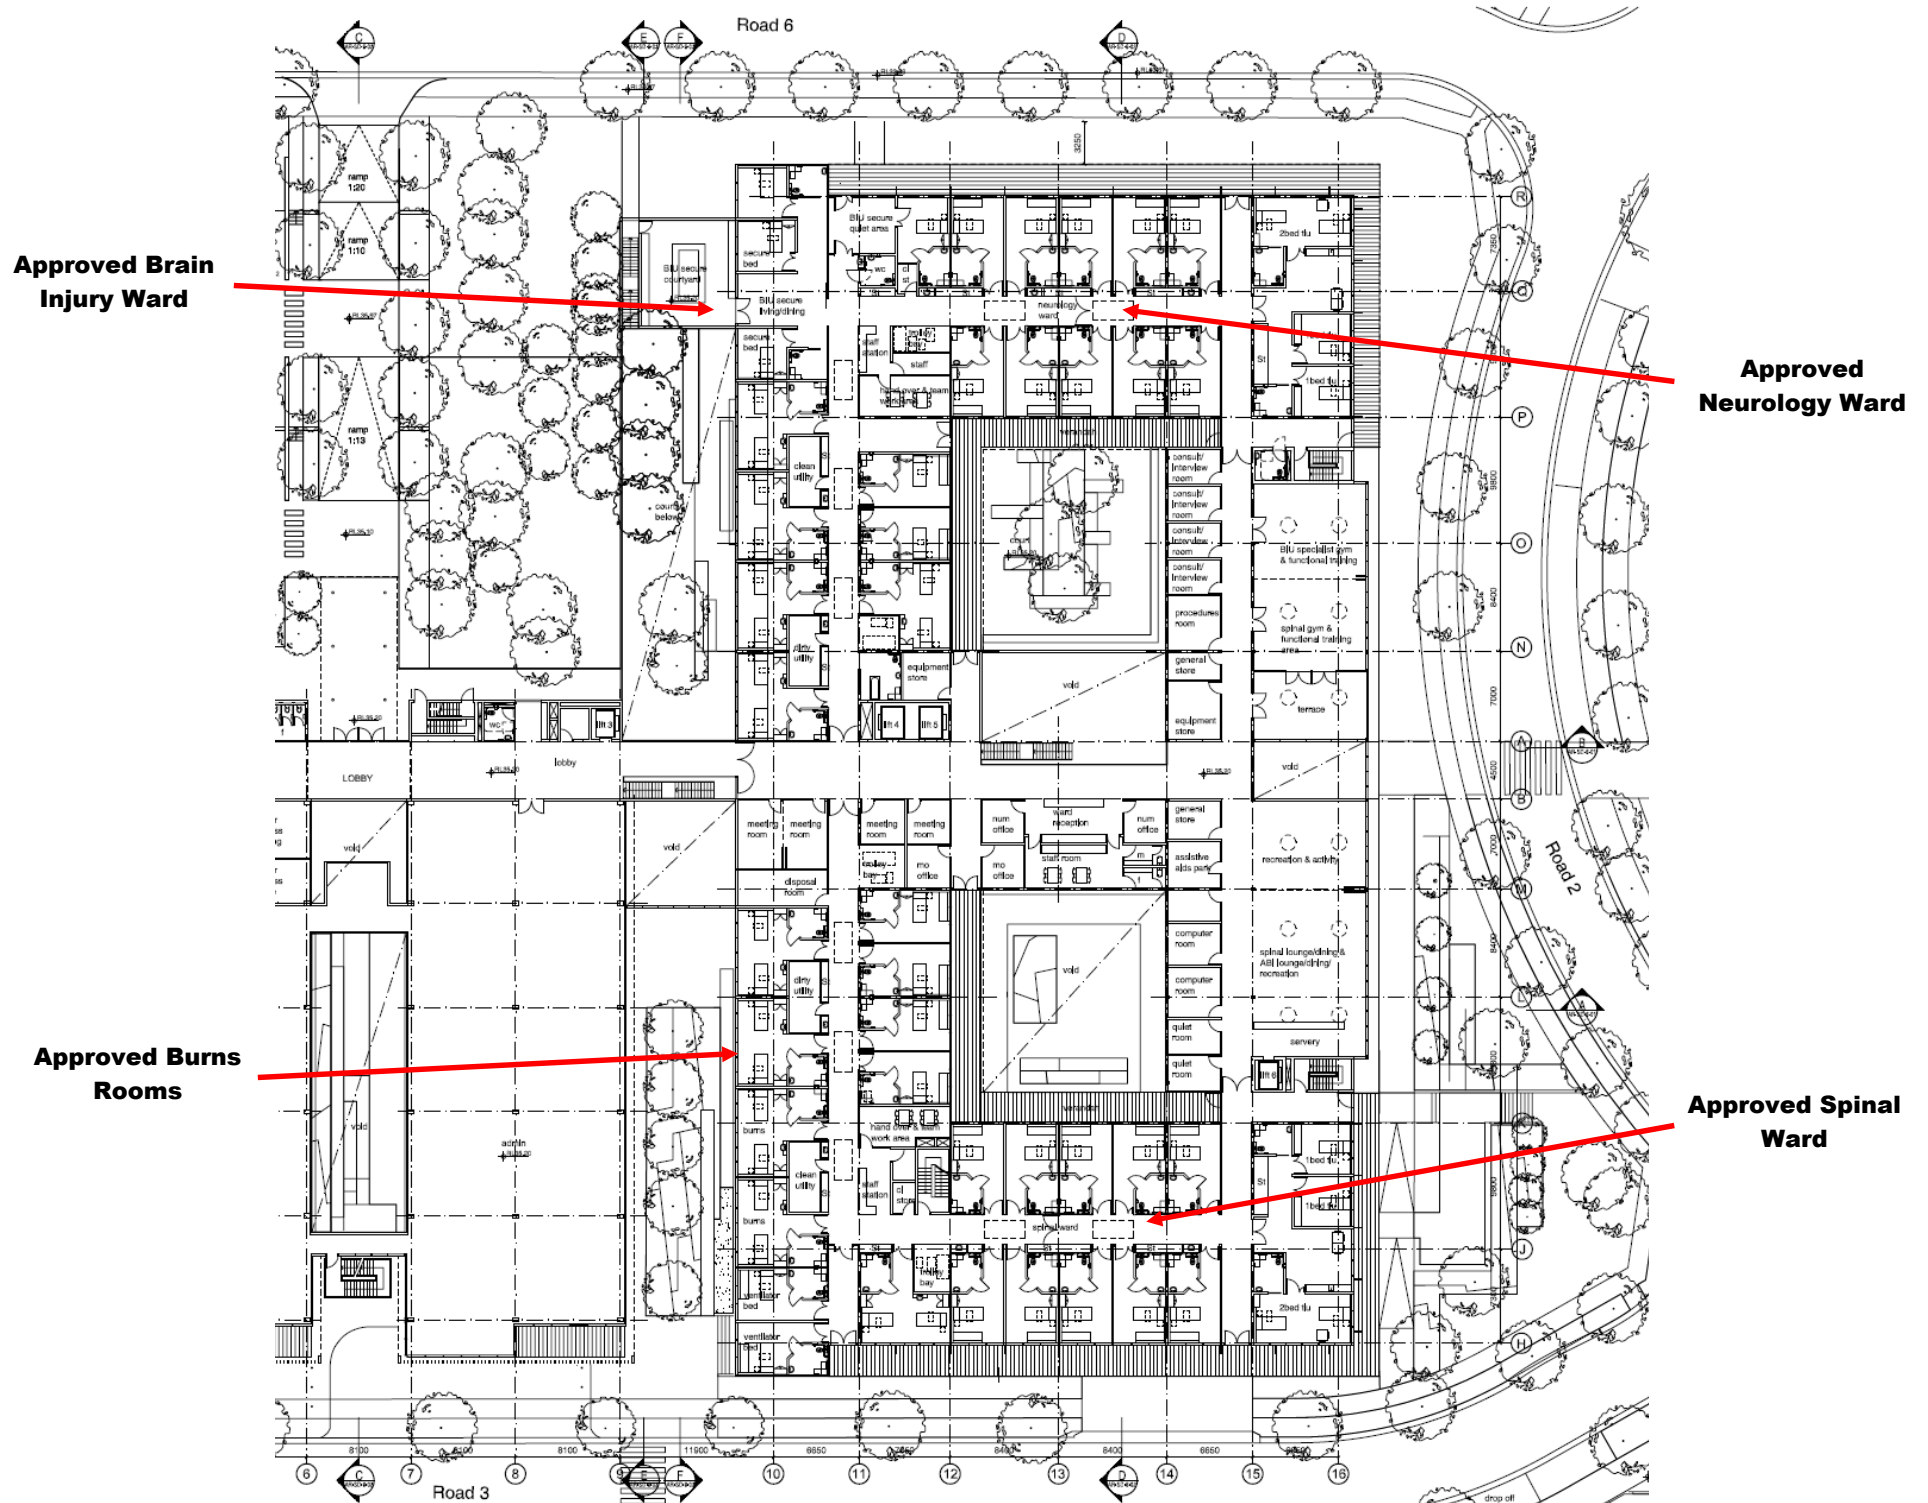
Approved Level 1 floor plan of Health Facility Main Building
